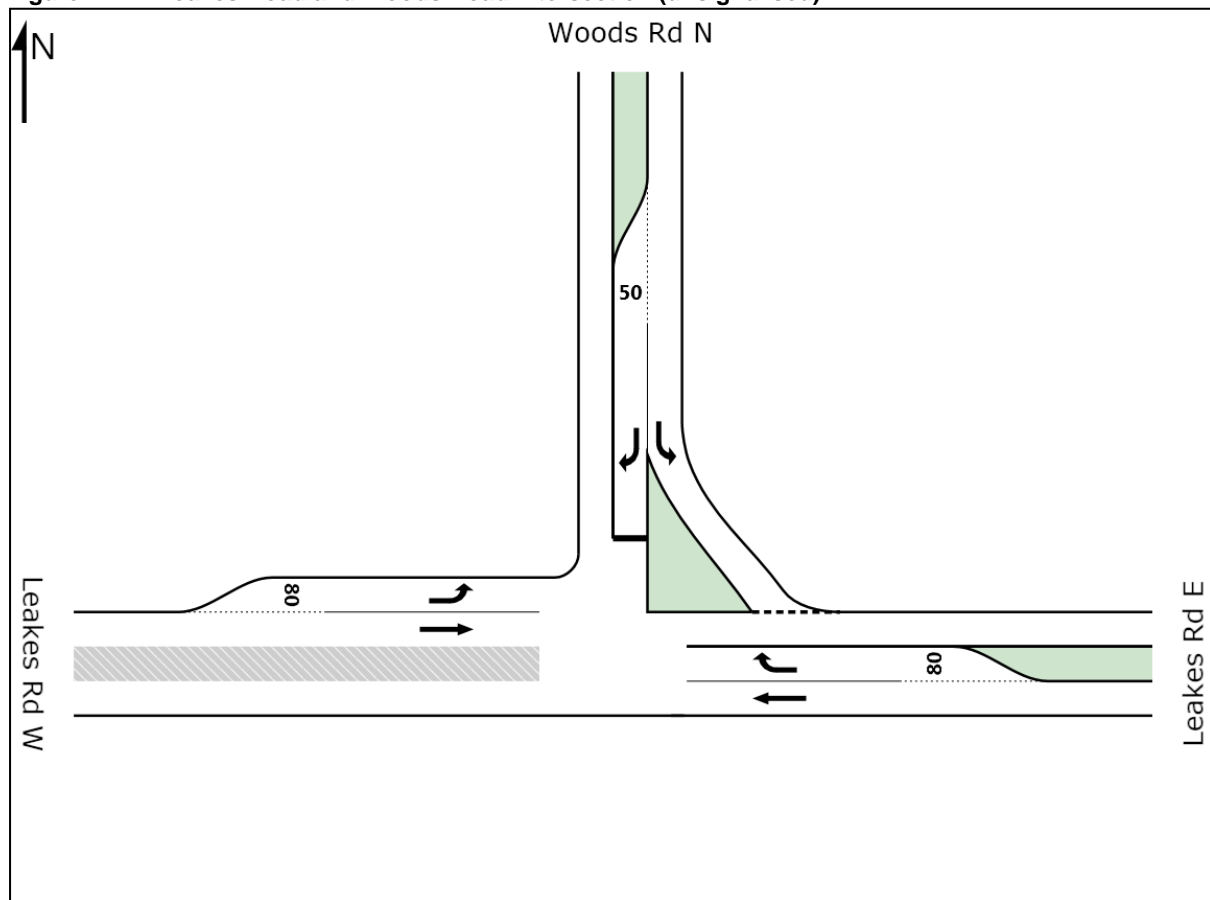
Leakes Road and Woods Road Intersection (unsignalised)
